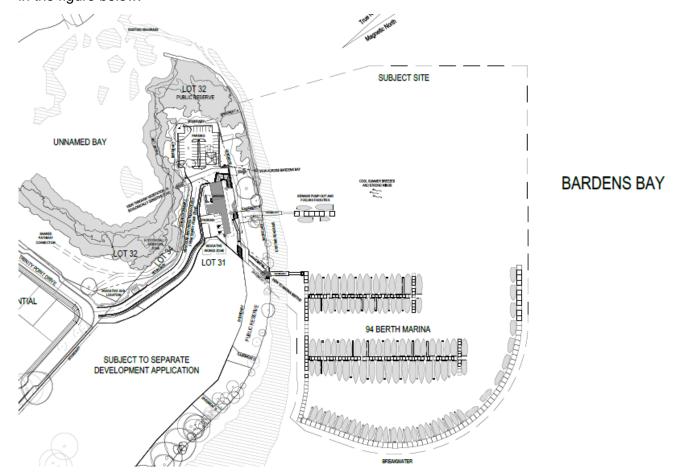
Concept Approval Mod 2 - Marina, Buildings and car park site plan
